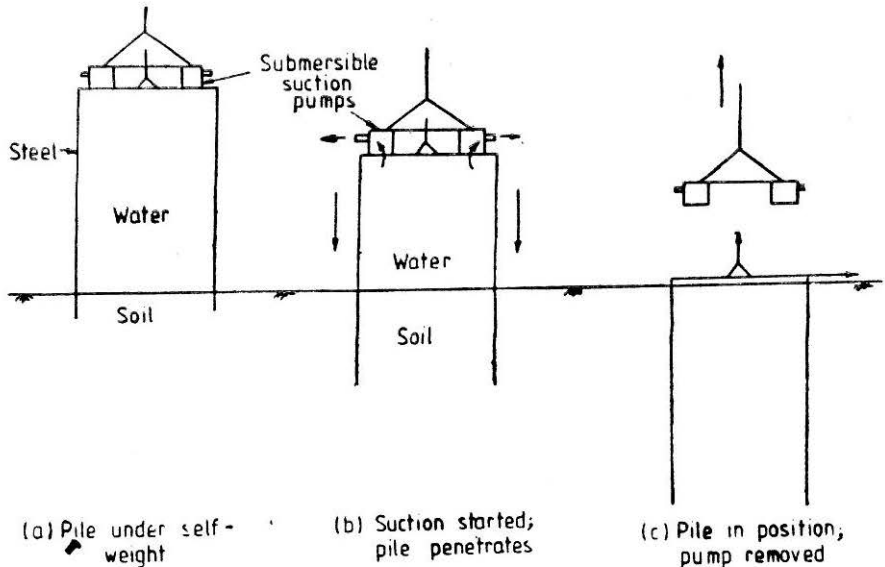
Short Steel Tubular Pile Installed By Suction
